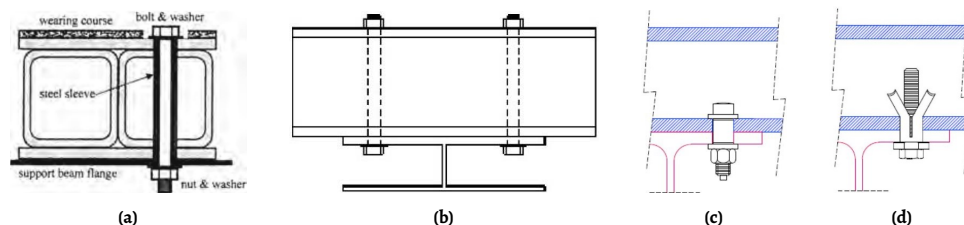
Traditional and blind bolts used in GFRP-steel bridges: (a) Long shaft with sleeve, (b) Long shaft, (c) Ajax bolt and (d) Lindapter bolt [50].
